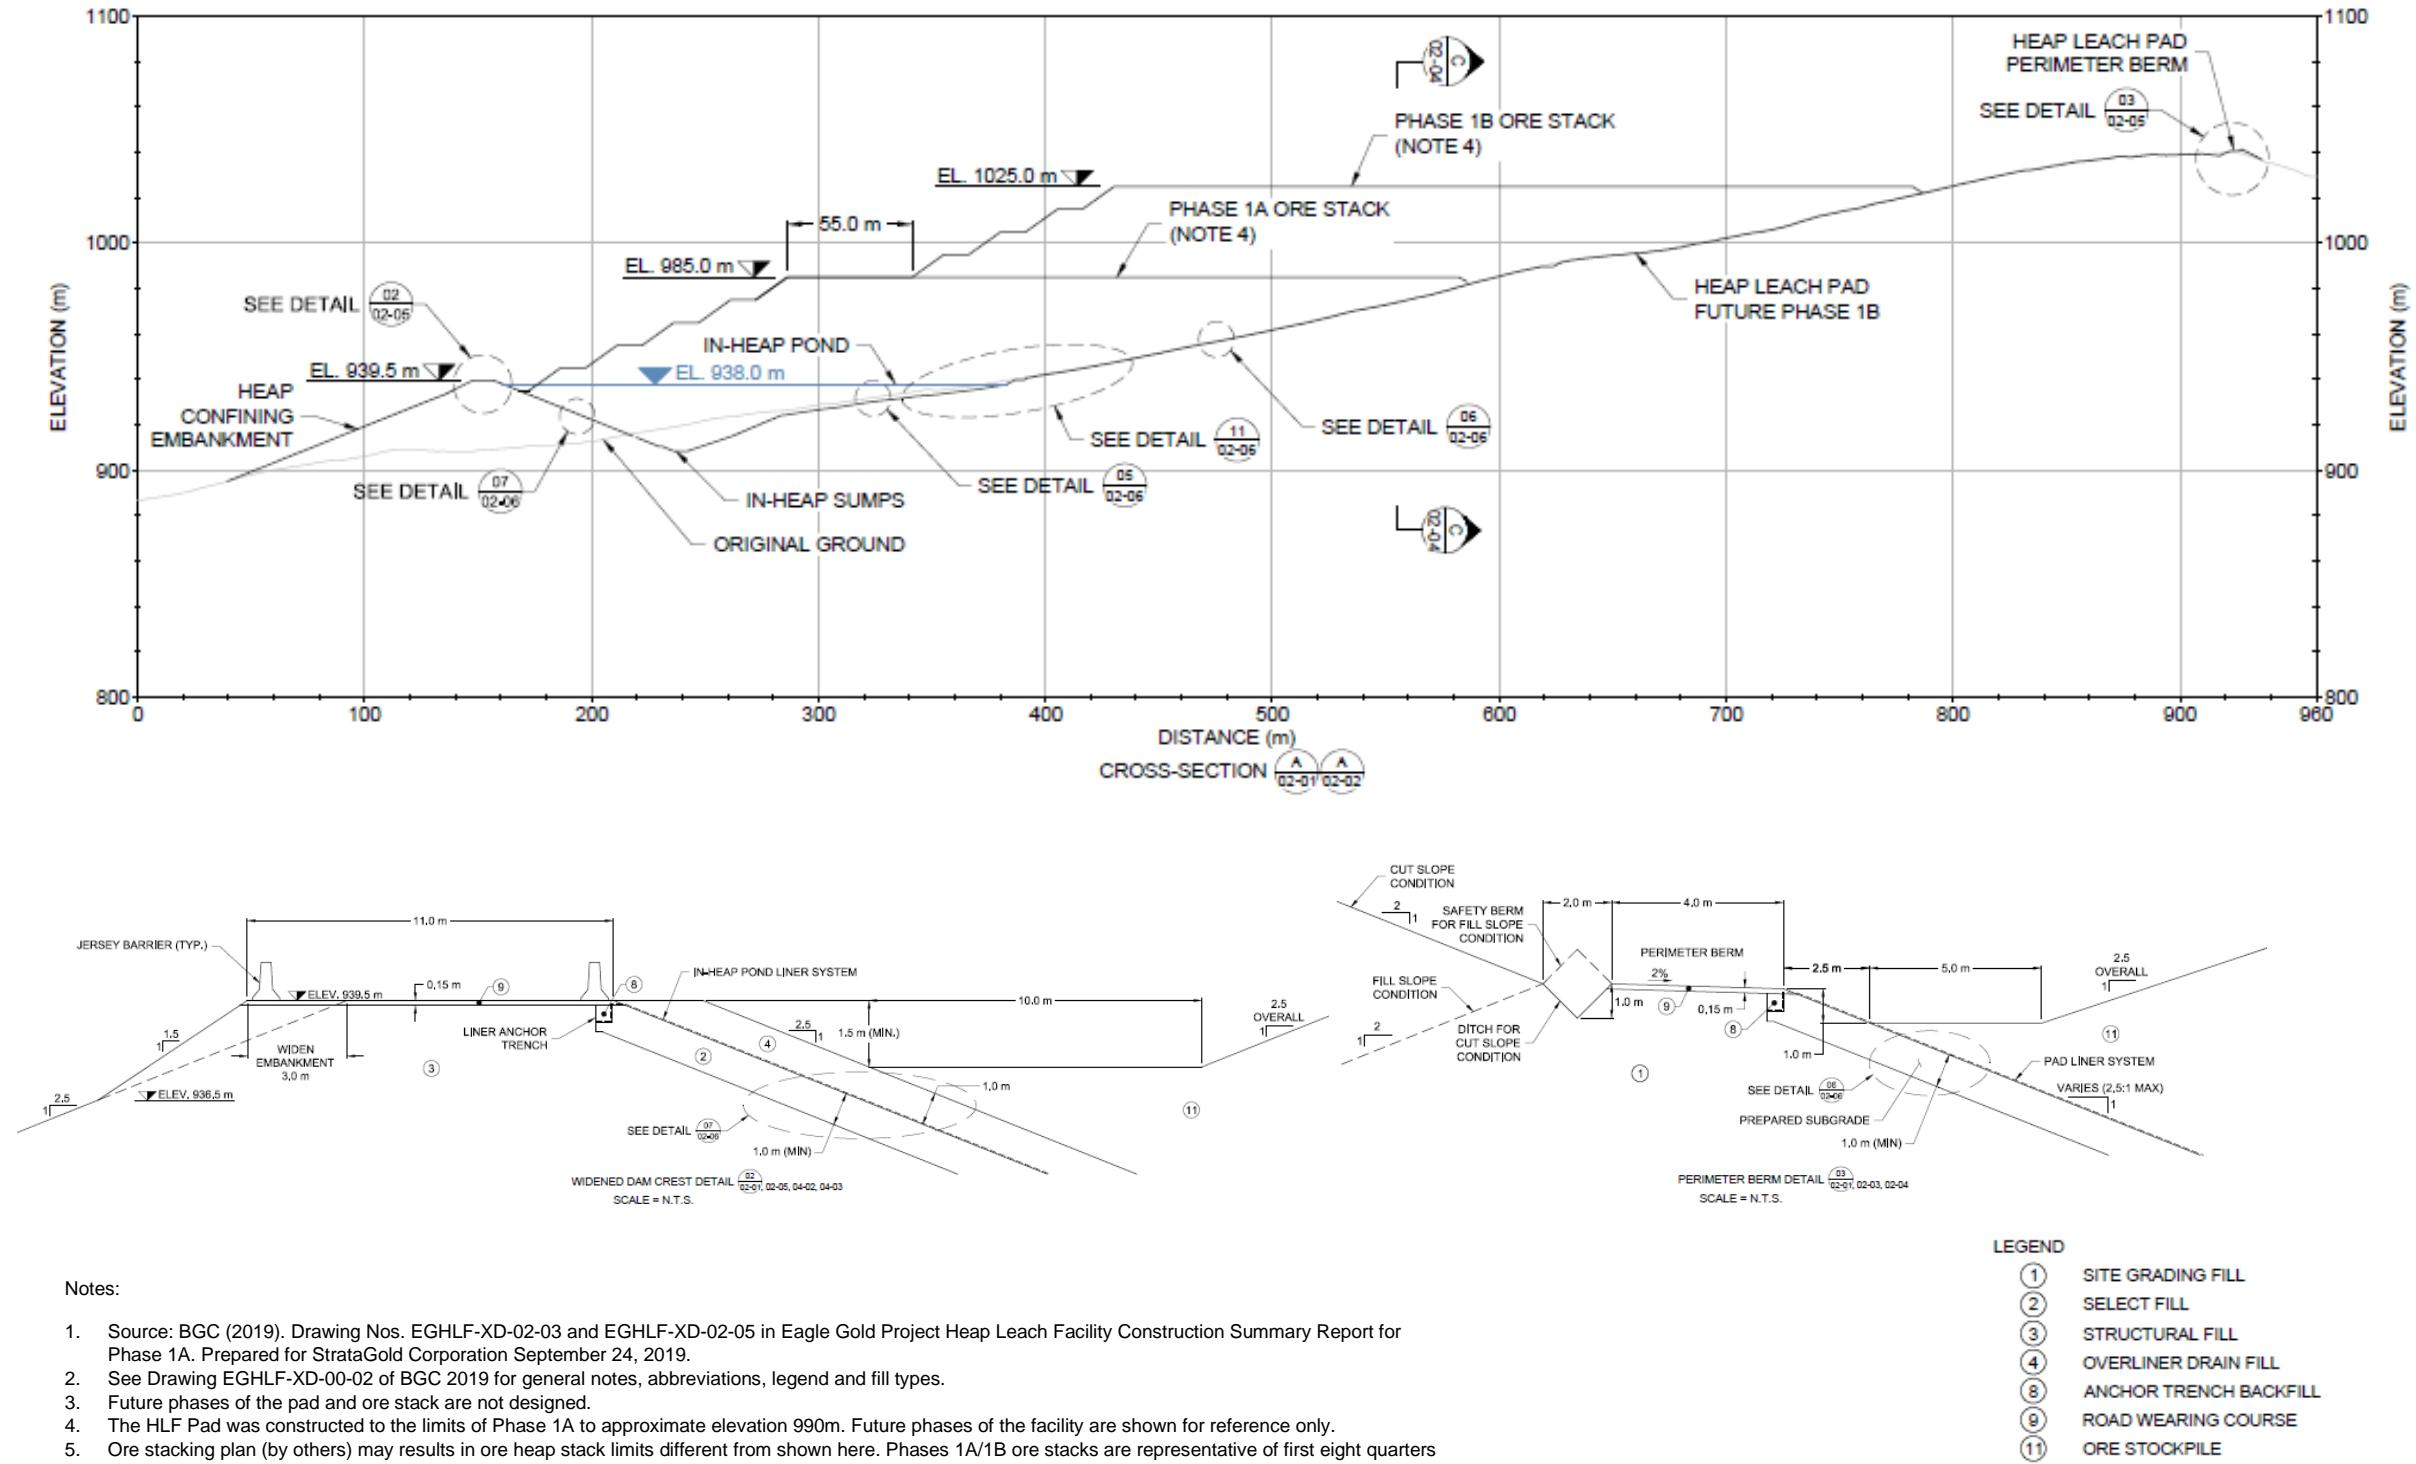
Heap Leach Facility Cross Section and Corridor Typical Sections
